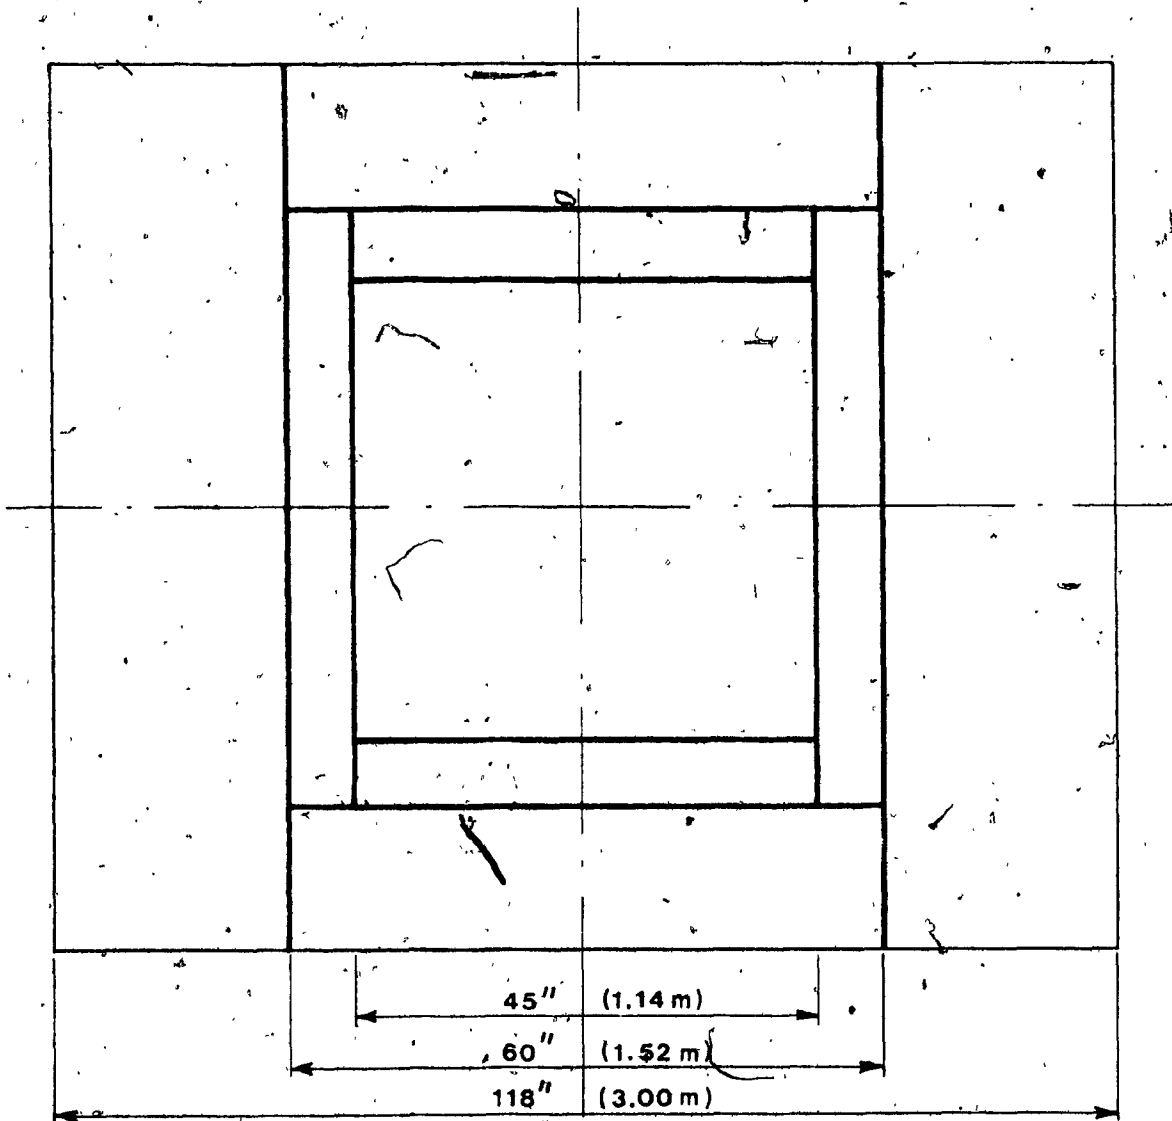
Framework Layout for Outer Wall Towards the Source Room and Both Inner Walls
